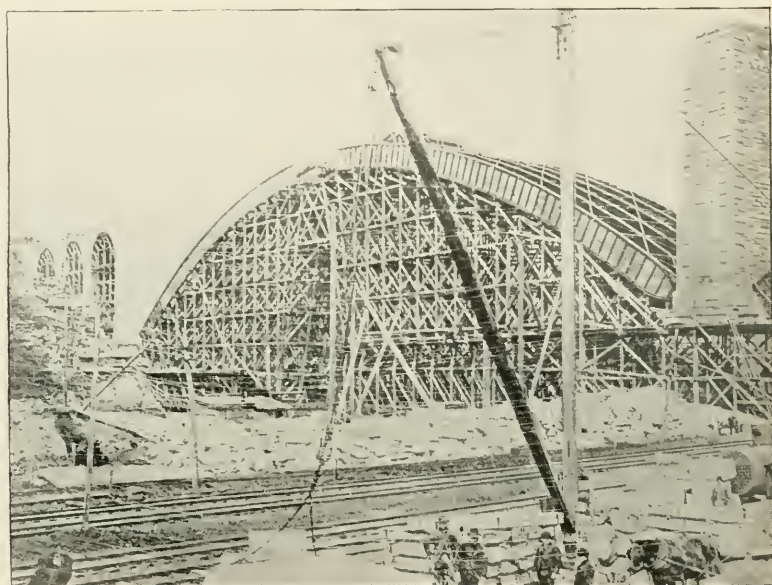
WASHINGTON BRIDGE OVER THE HARLEM RIVER.
